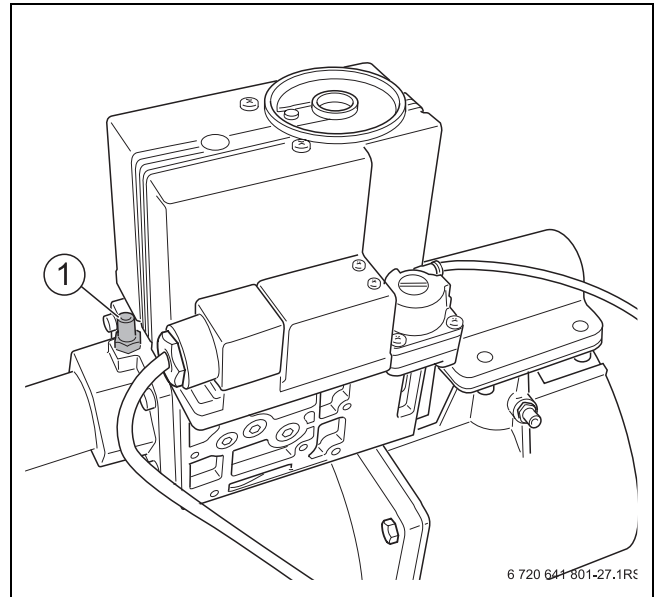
Checking the gas supply pressure (boiler size 160 kW)
